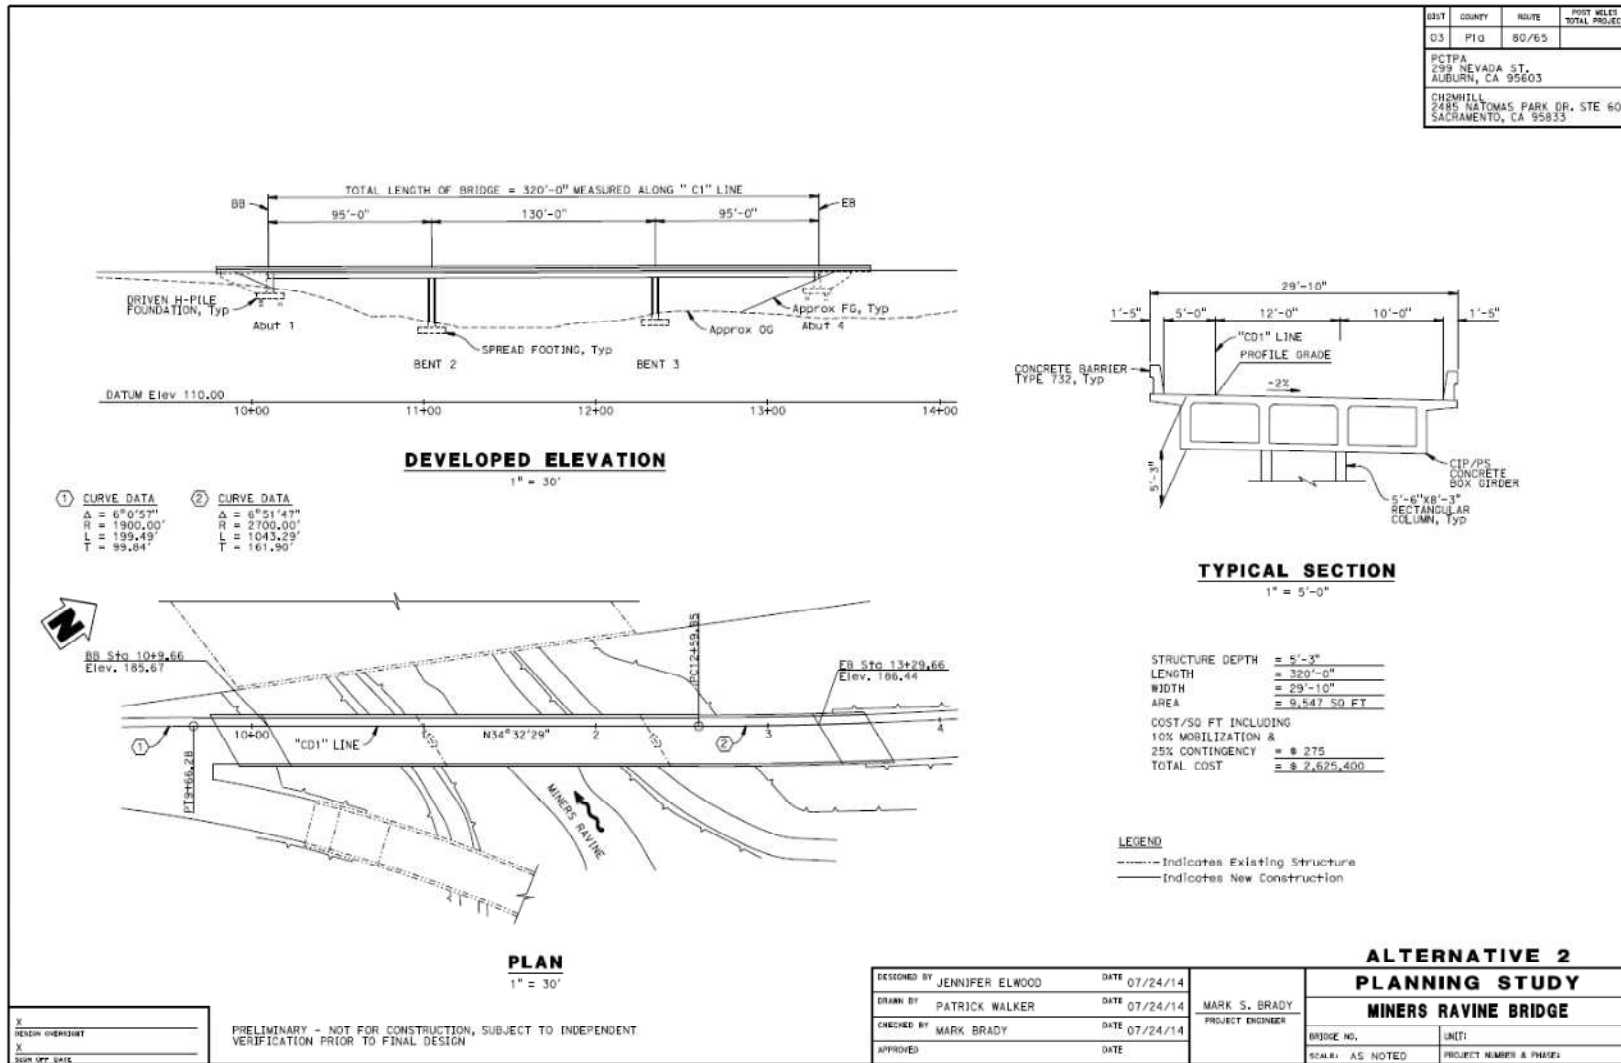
Proposed Miners Ravine Bridge at Miners Ravine Planning Study (Alternative 2)
